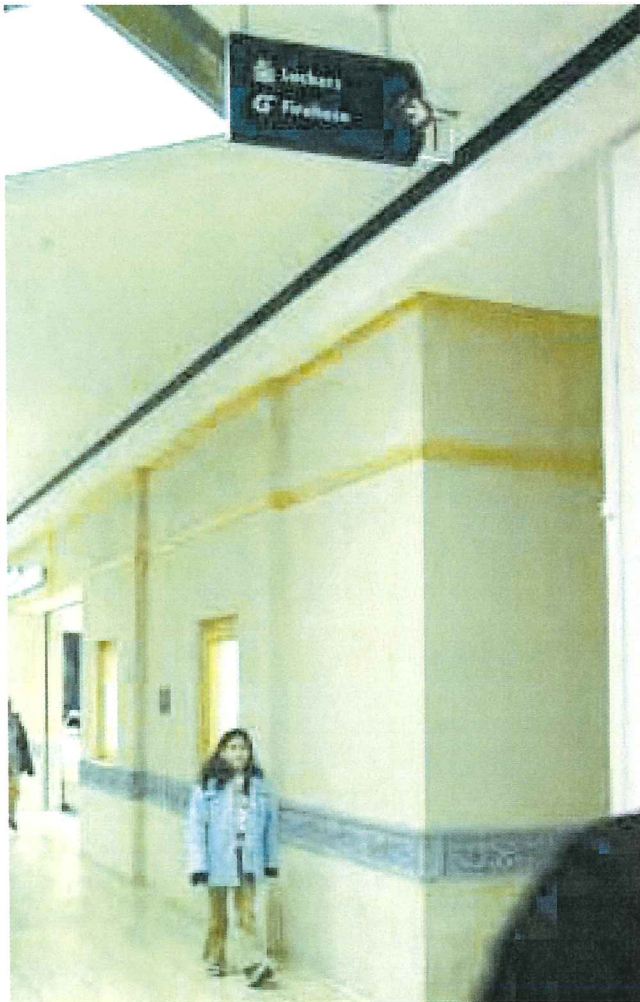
Stripe on column to identify hose connection location in a parking garage.
